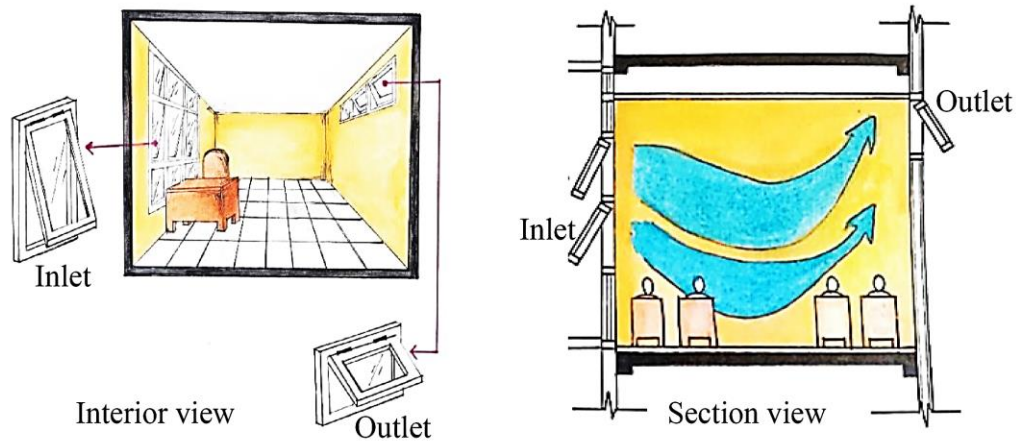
5 Plan view and section view of inlet and outlet openings (A'yun, Widiastuti et al. 2020)
